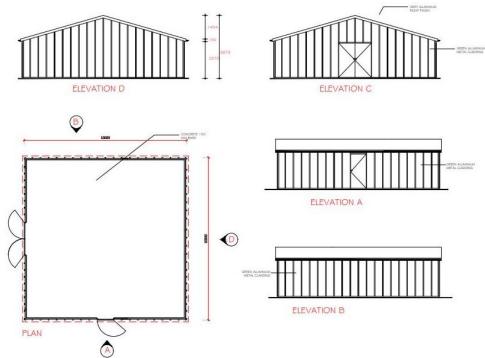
Proposed storeroom floor plan and elevations – previously refused application (21/05790/FULL1).
